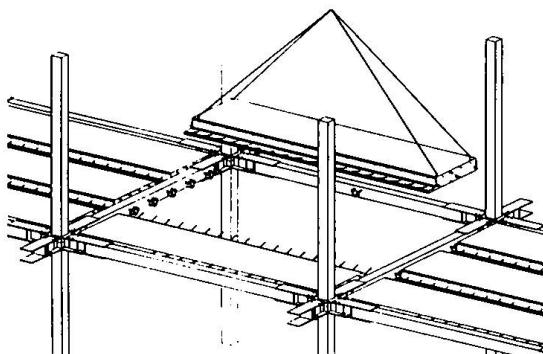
A composite structure with steel MRF and RC prefabricated slabs.
